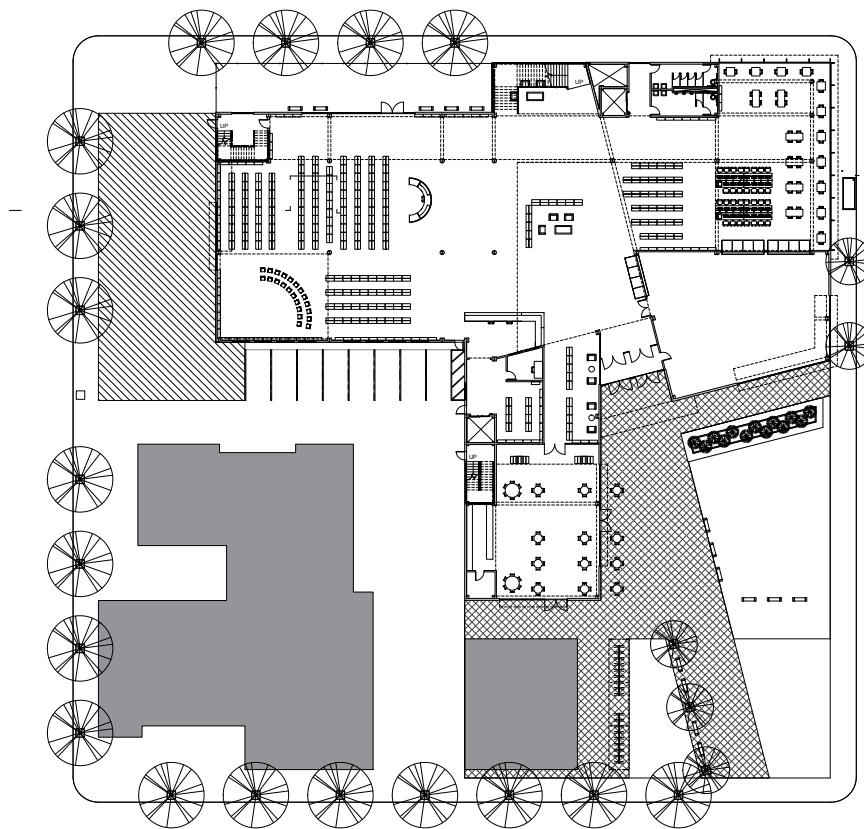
First floor plan showing scheme and plaza (Ian Korn).
